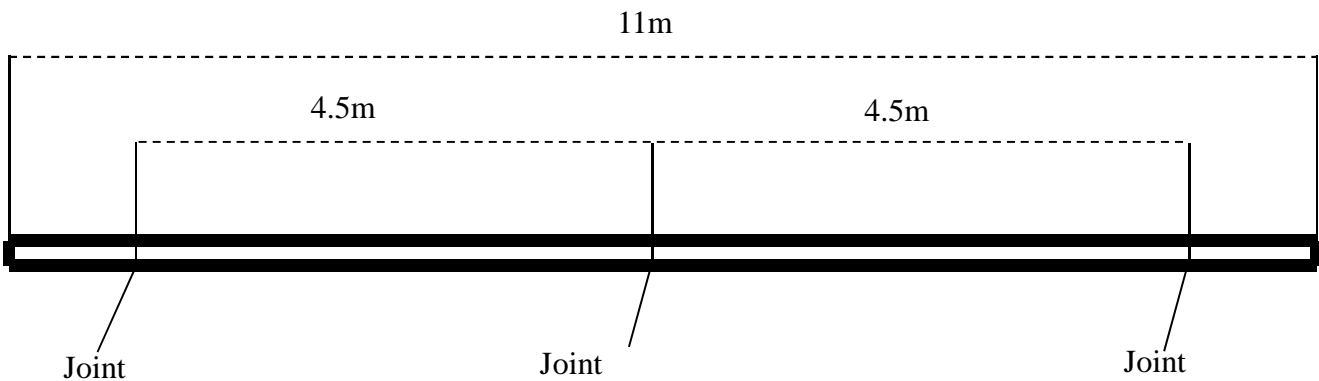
Concrete strip with 4.5 m spacing between saw cut joints
